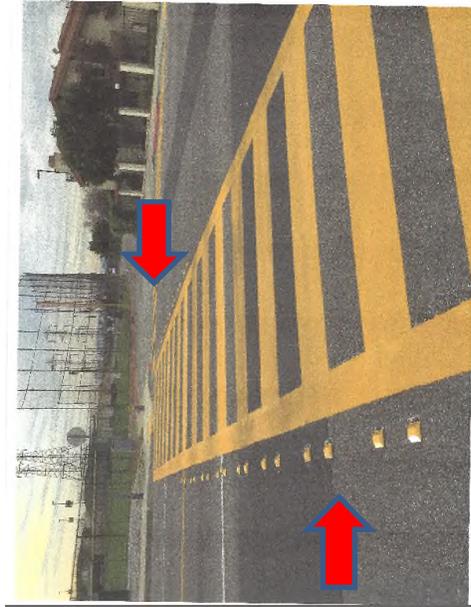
Type D Marker Installation at Vail Avenue and Appian Way – North Approach
